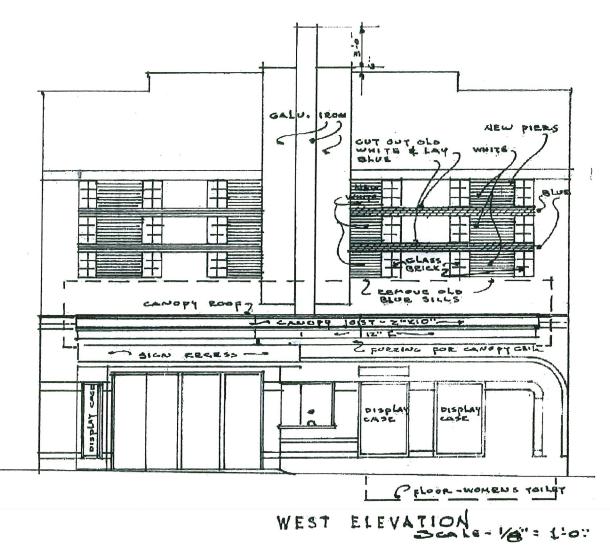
Front elevation, original plans, looking east (original renovation plans)
